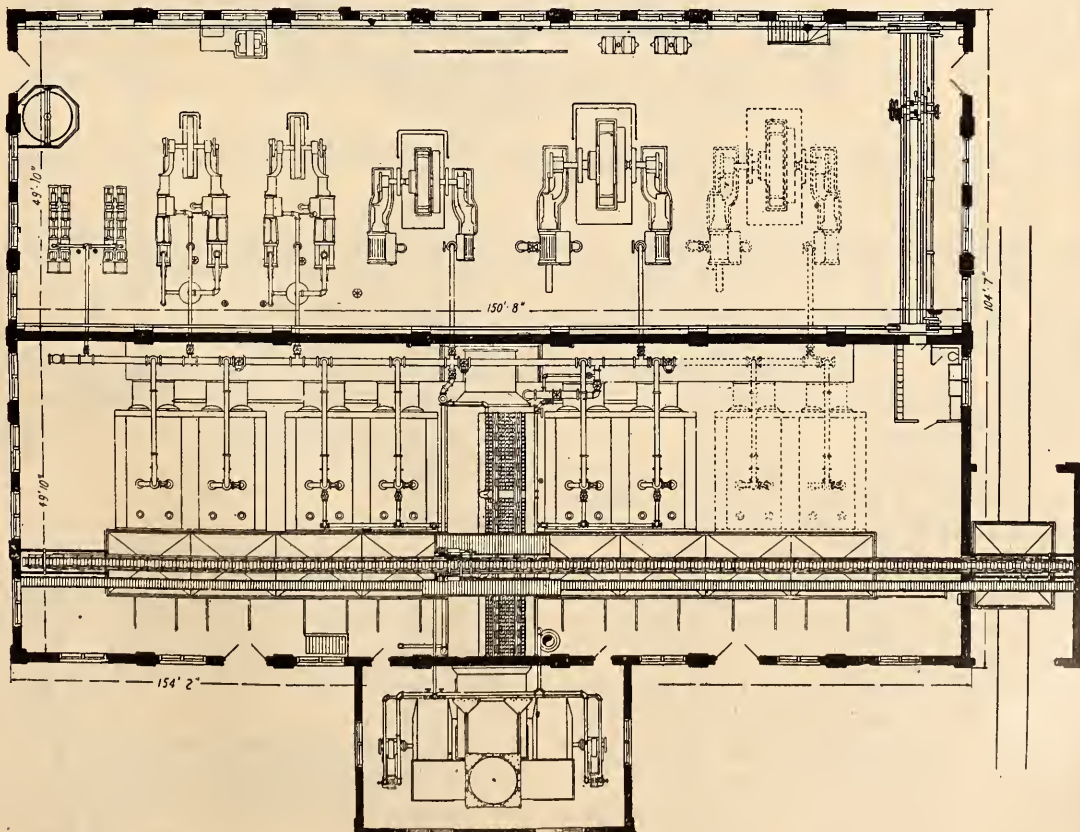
POWER HOUSE PLAN—NEW SHOPS OF THE ROCK ISLAND SYSTEM AT EAST MOLINE, ILL.
